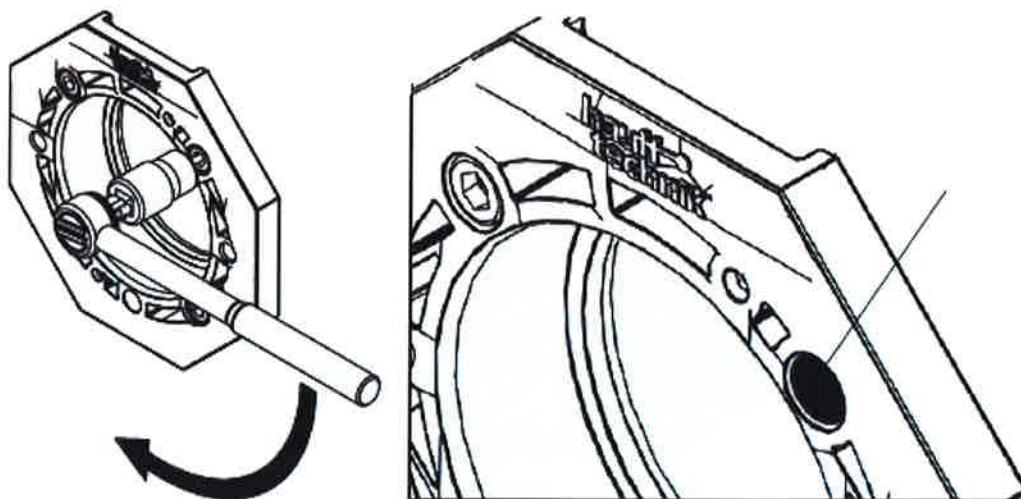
Tightening the four internal hex screws of the inner seal (left) and attaching the appropriate black screw protection caps (picture of the manufacturer).
